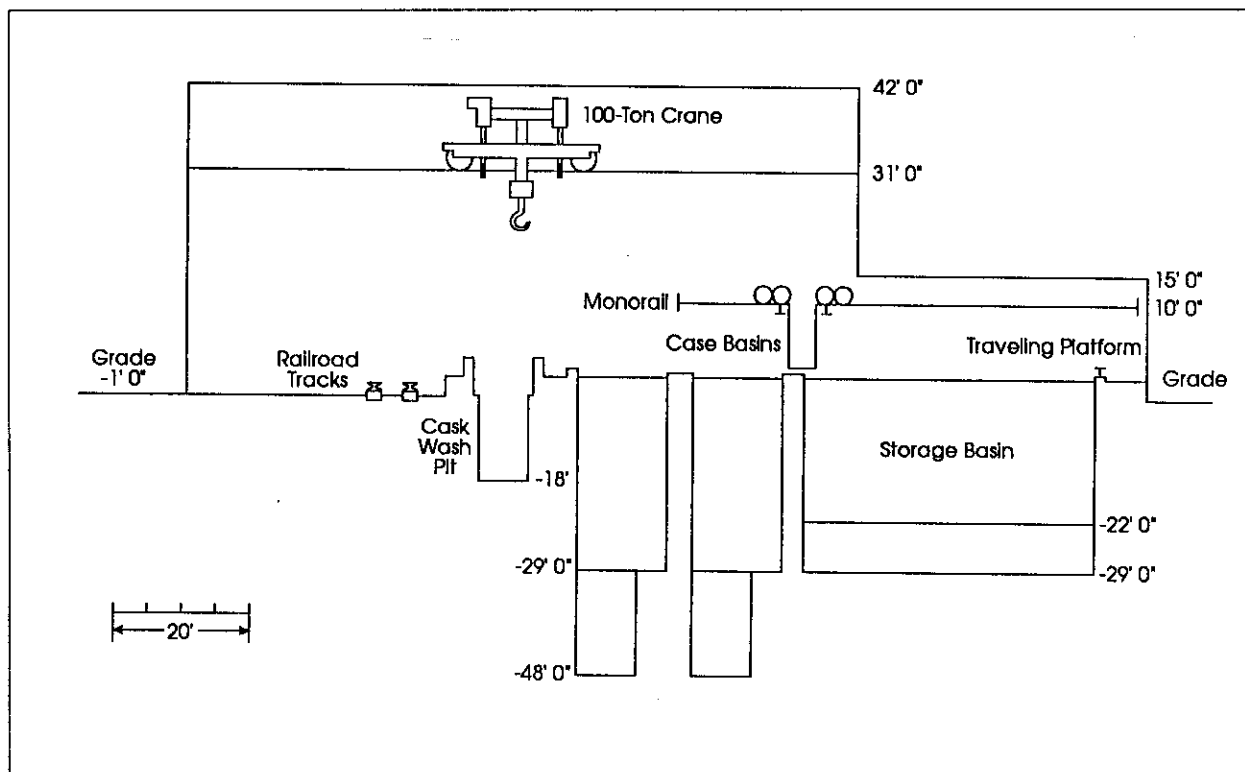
Elevation Schematic of the RBOF (Facing East)
